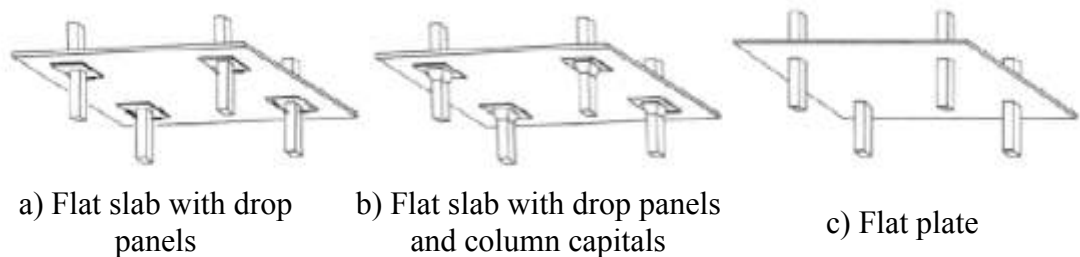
Types of slab-column connection (Park and Gamble, 2000)
